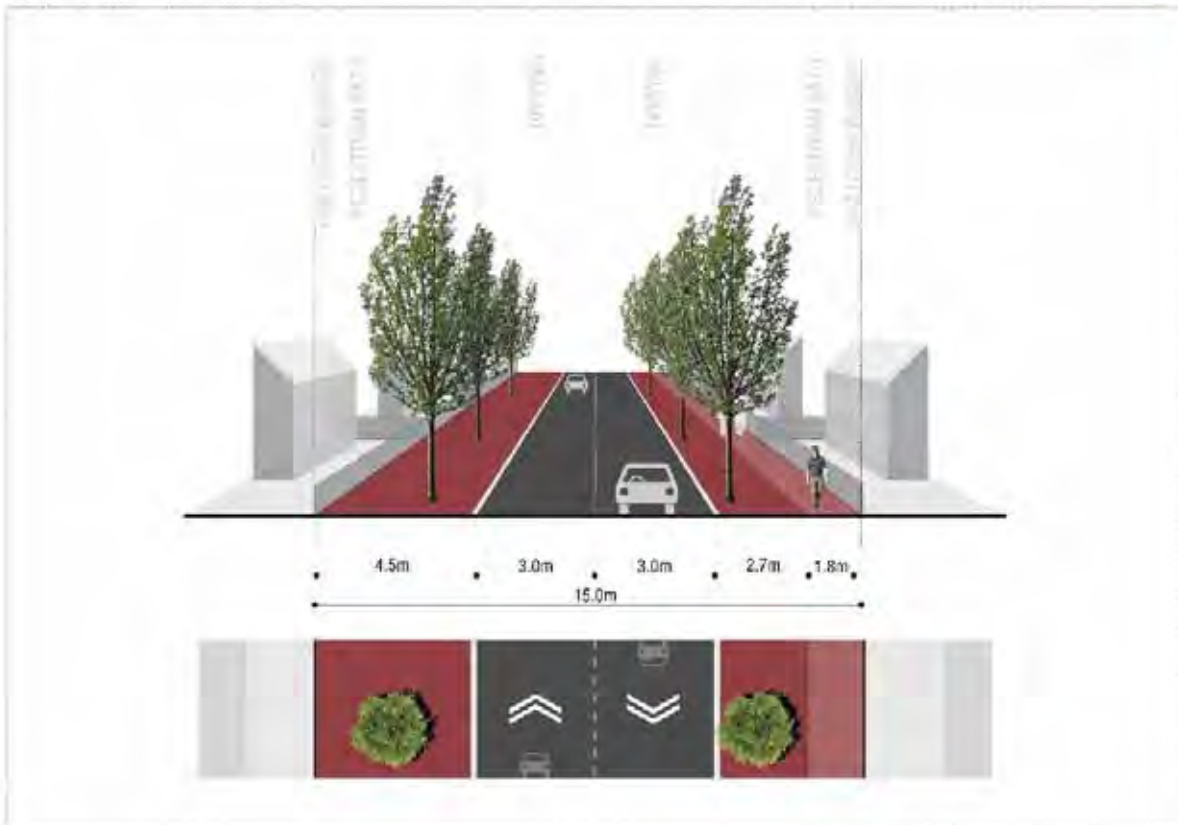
Modified Access Street D (Adjacent to the Proposed POS)
